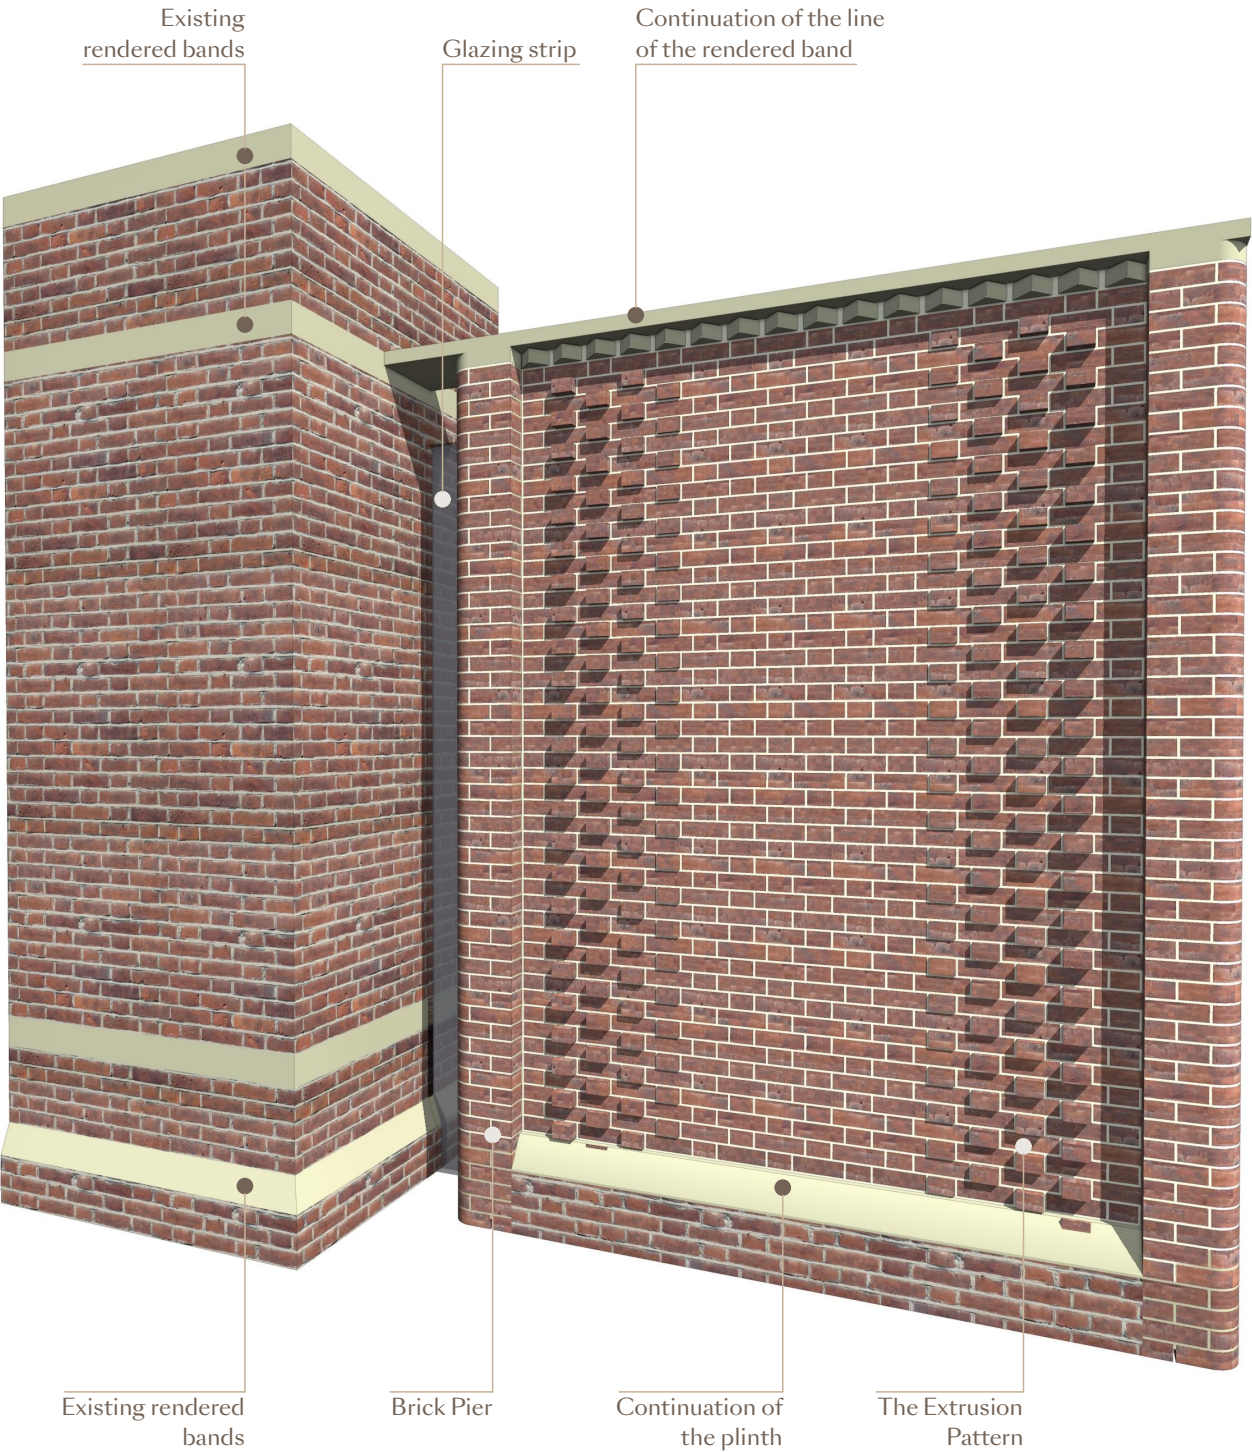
3D image of the Athlone House / Walled Garden junction. Author: SHH.
